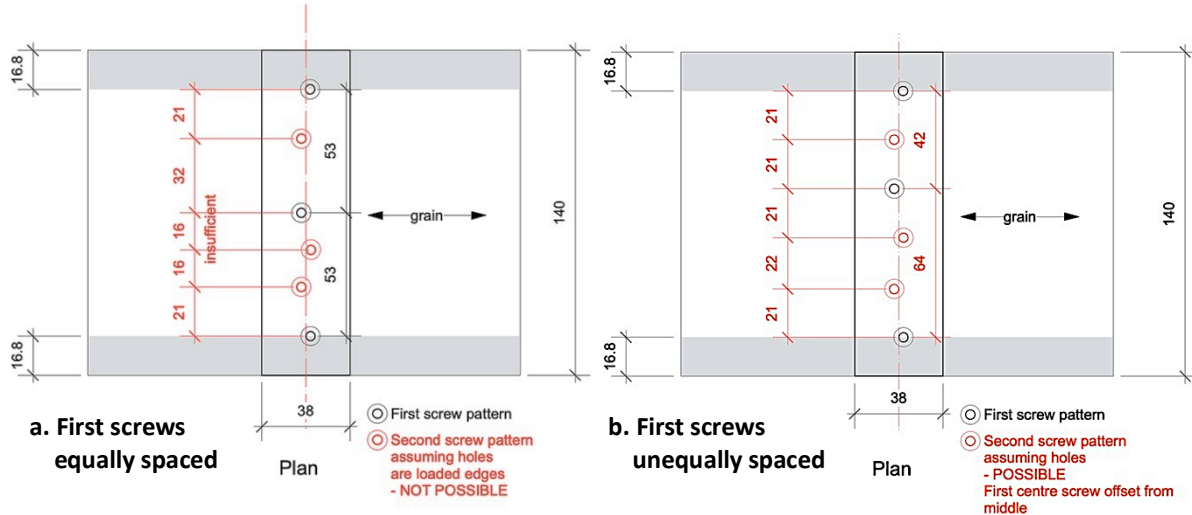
& b: First and second (red) use screw locations in 140mm stud (Shotton 2021)
